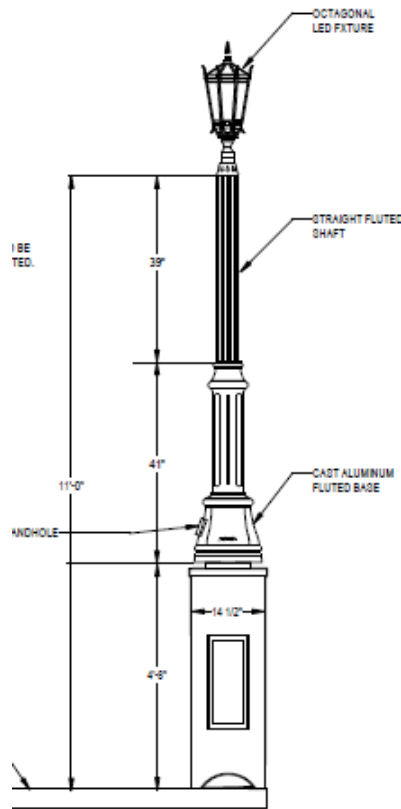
Proposed Pedestrian Bridge Lights Figure 26 – Photo of Light Fixtures at Elm Street Station
